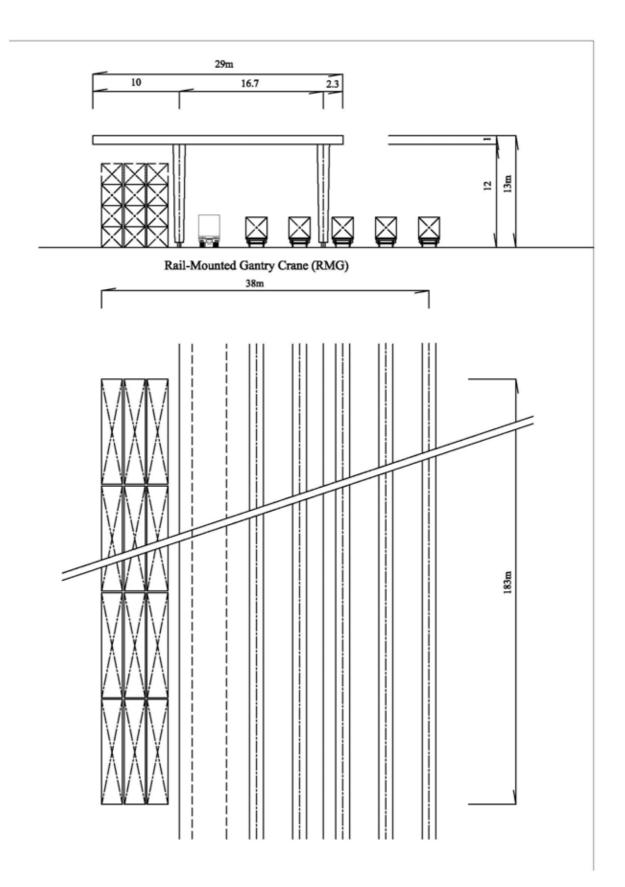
Facility Layout Plan of a Container Railway Yard
